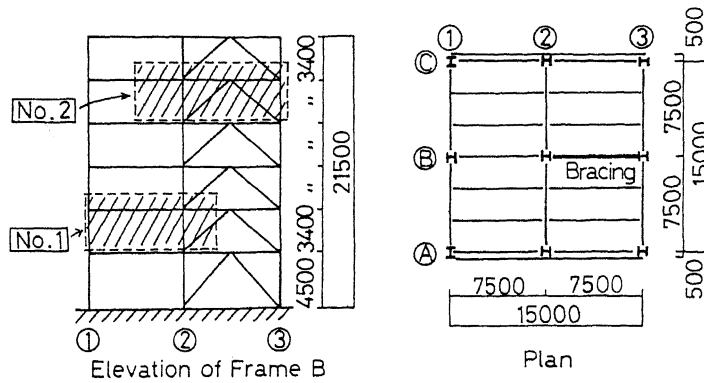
Plan and Elevation of the Six-Story Steel Building
